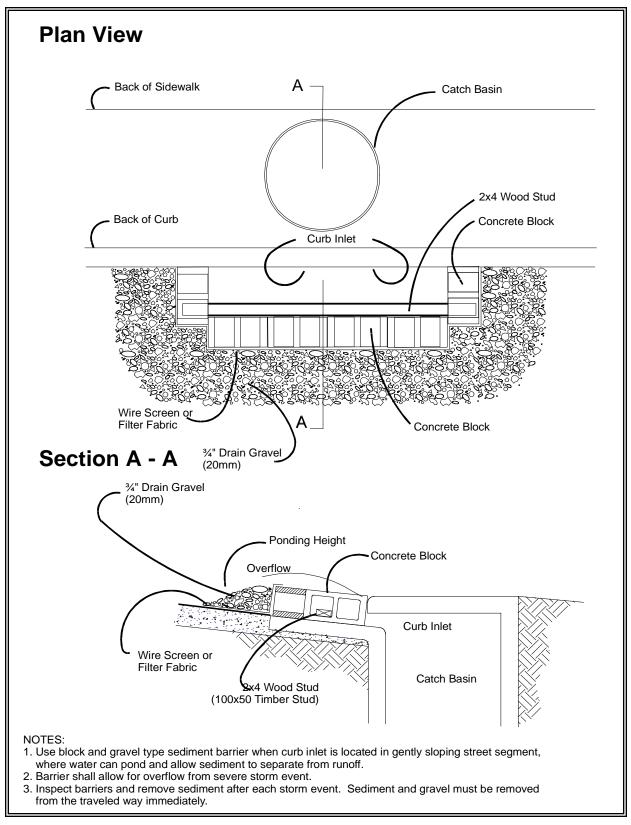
Block and Gravel Curb Inlet Protection
